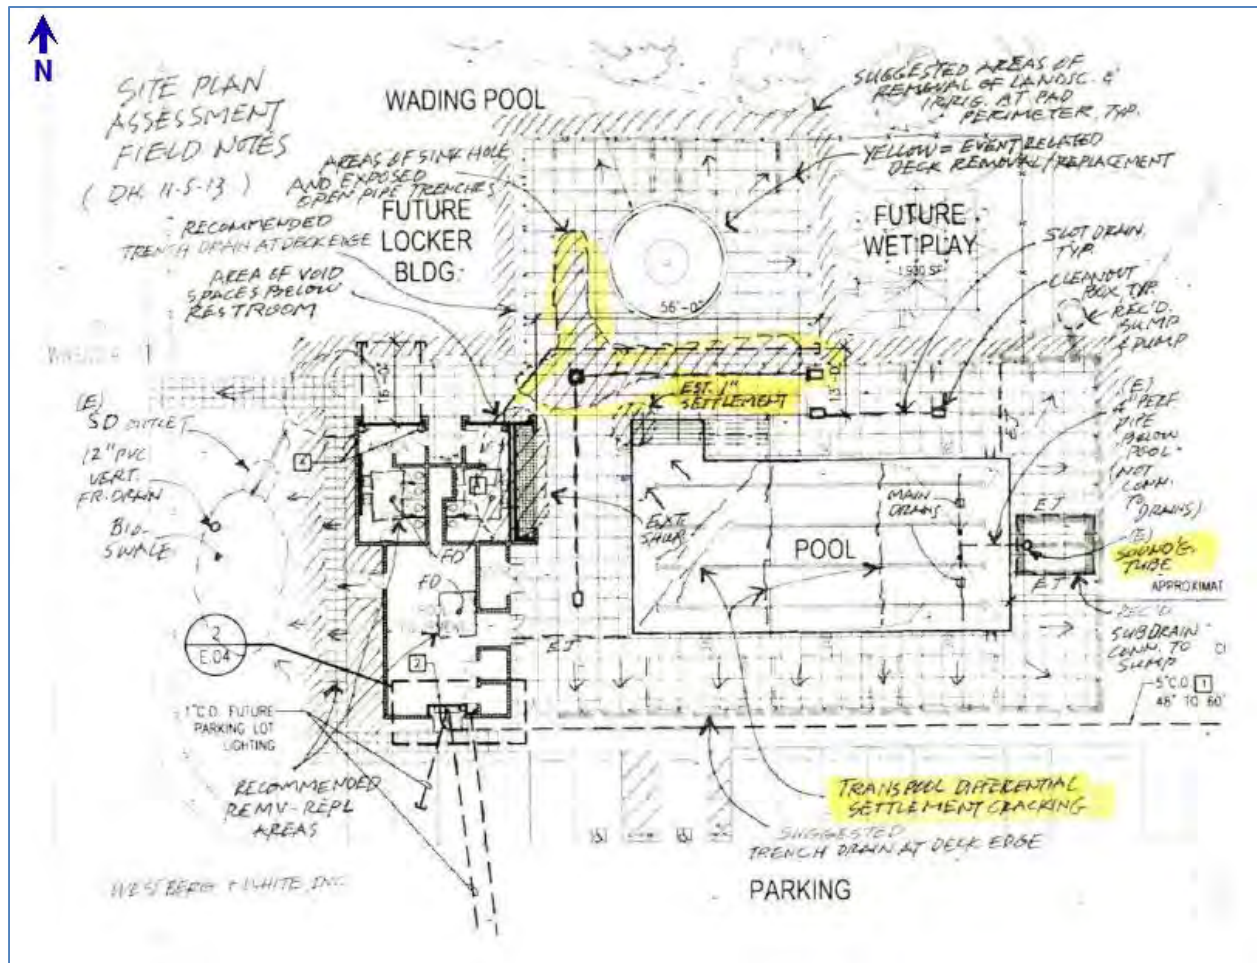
Excerpt from Westberg + White, Inc. Report Page 13. Note cracking in swimming pool floor.
